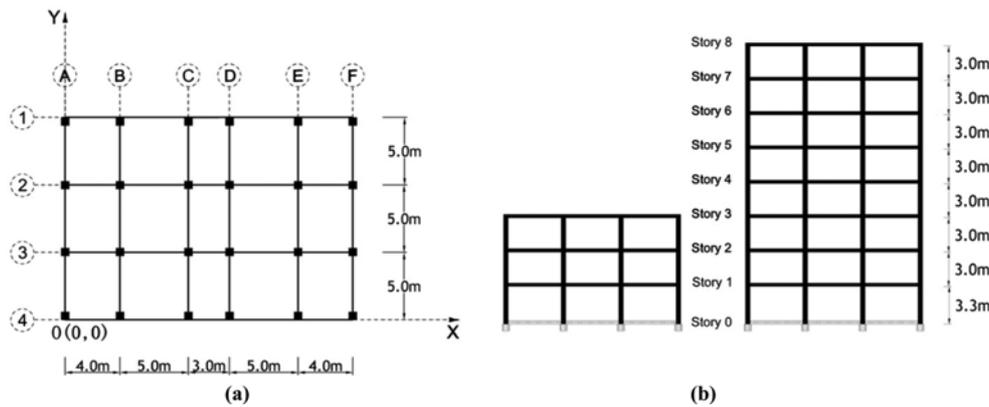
(a) Plan, (b) Elevations of the Studies Structures
